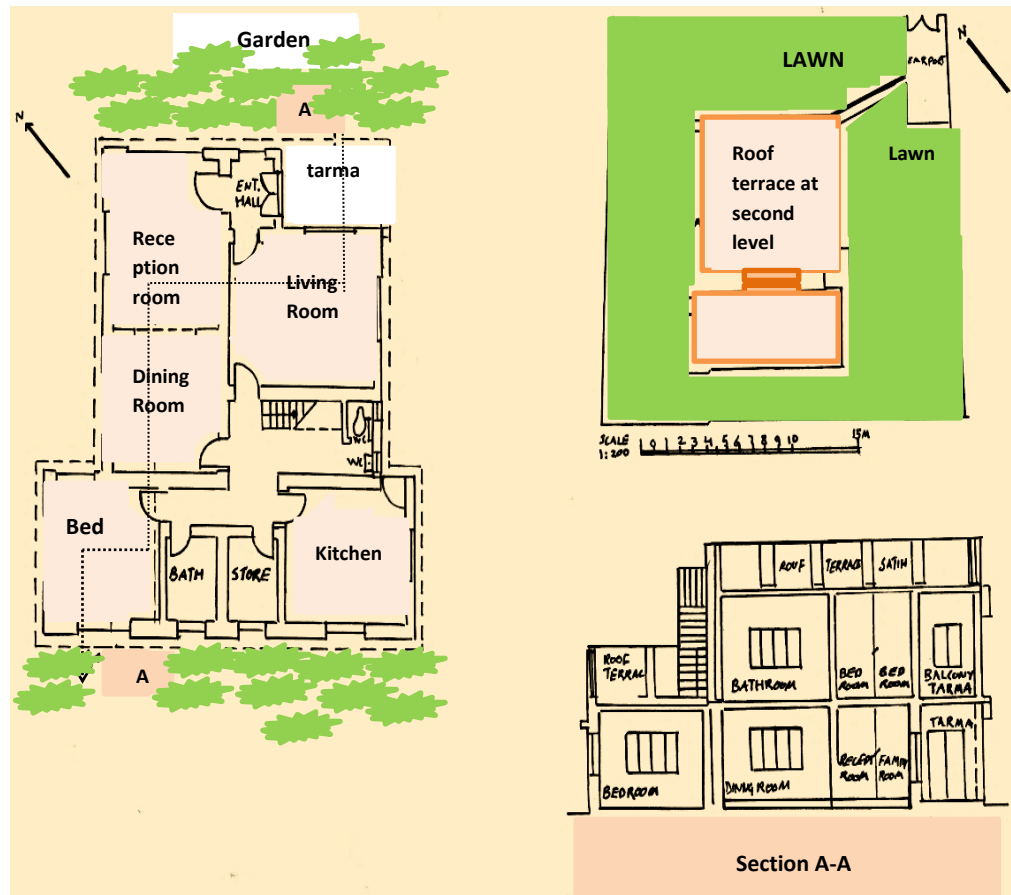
Site plan and ground floor level plan with section A-A of modern house No. 1. Scale 1:100
